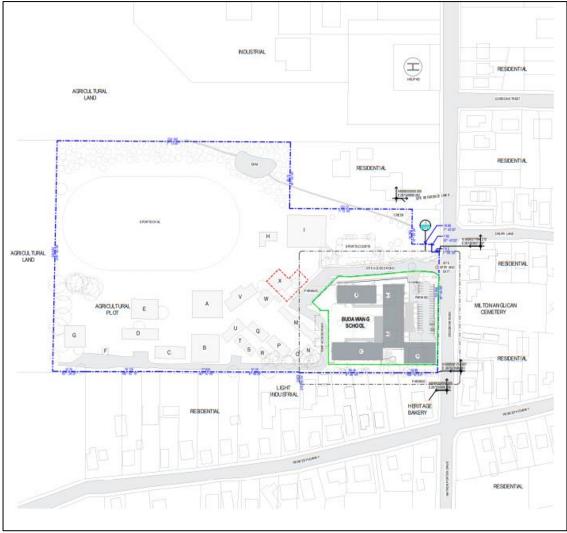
Site location plan from the proponent's PP showing the approved Budawang School development and proposed new location of the childcare centre (subject to separate approval) depicted by red dashed line ('Building X')
